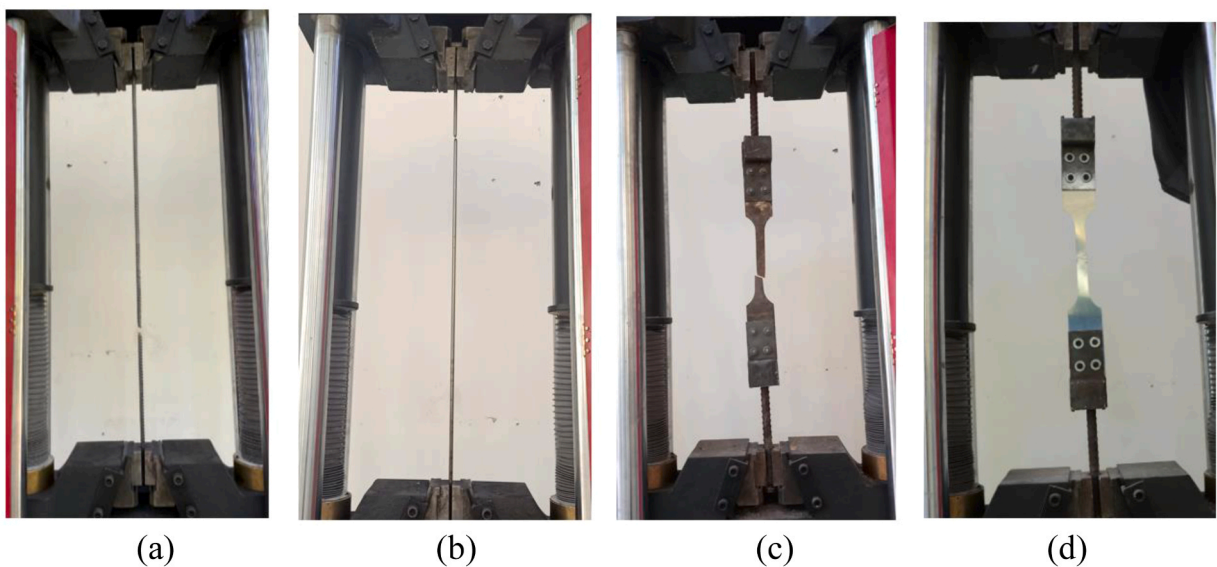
Tensile coupon testing of (a) steel bar, (b) pre-stressing bar, (c) steel plate, and (d) SSS.
